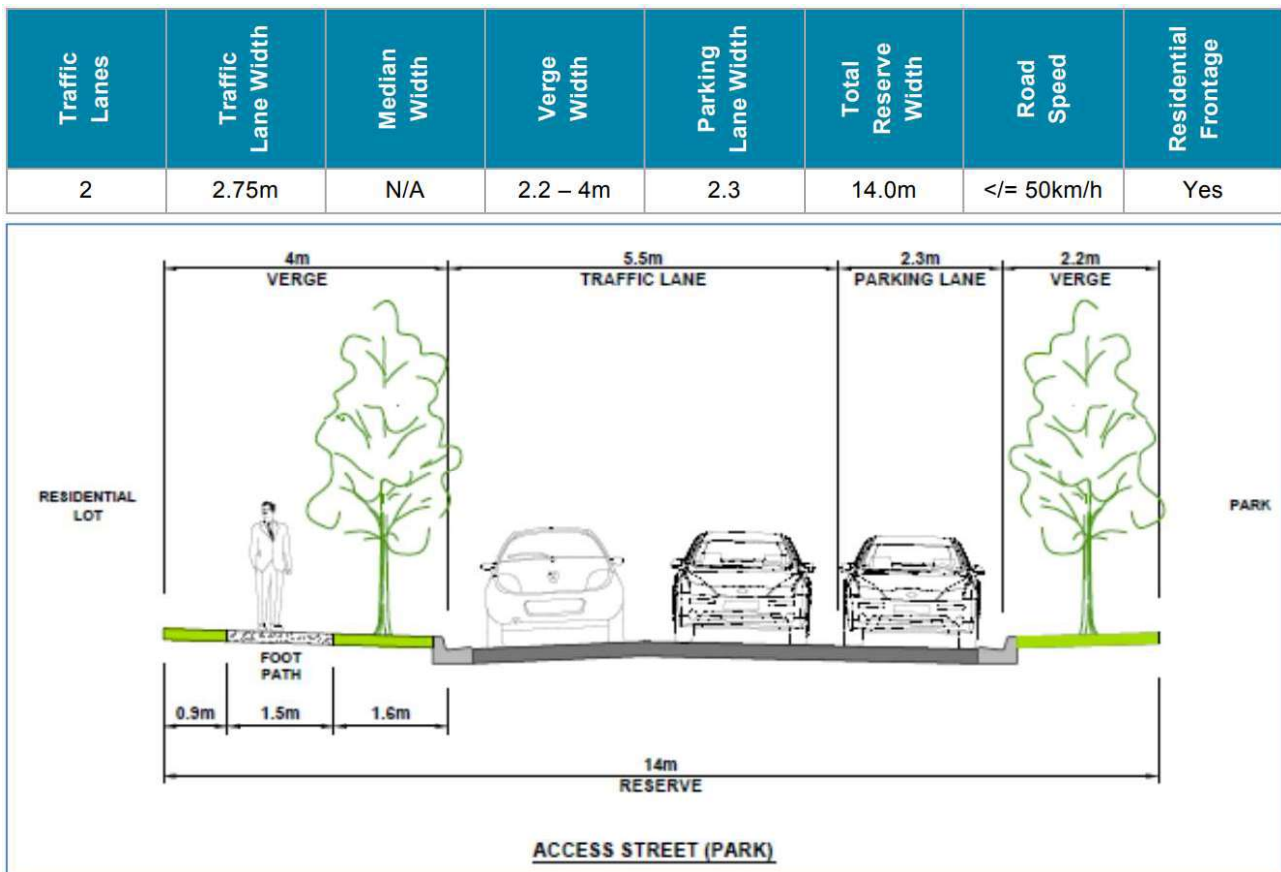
Access Street (Typical) cross-section (source: MWH MNIMP)
